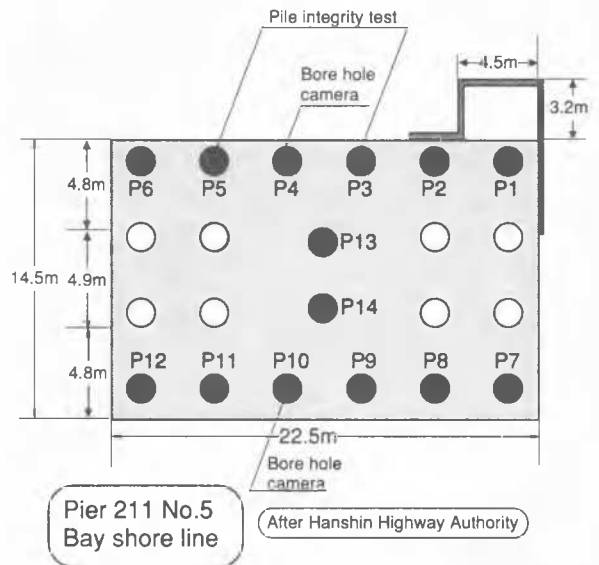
Plan view of the foundation of Pier 211 (Hanshin Highway Authority, 1996)
